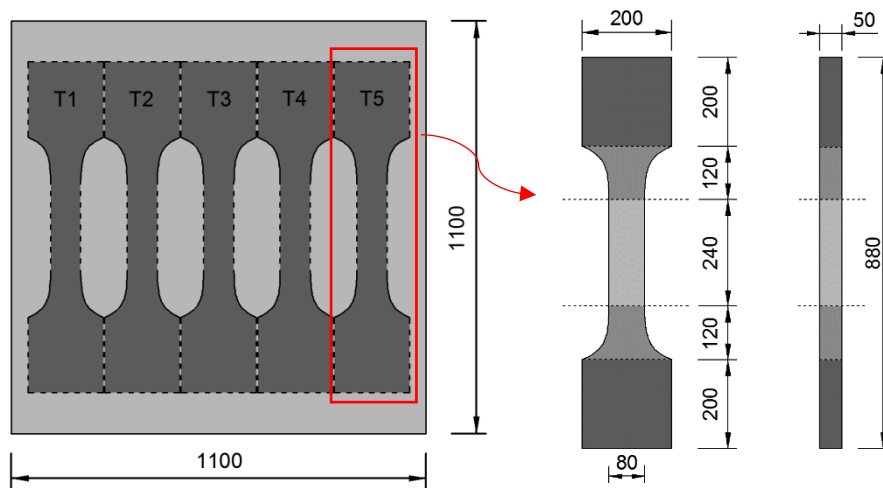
Extracting of dumbbell specimens and dimension of dumbbell specimen (unit: mm)
